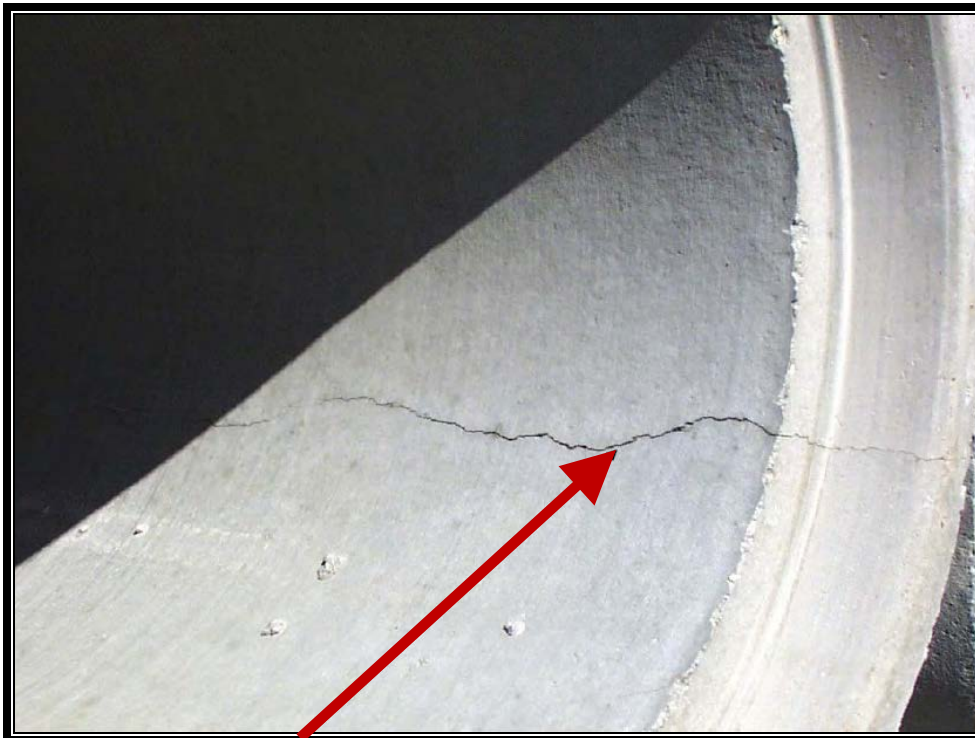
Crack Exceeding 0.01 in. and 12 in. in Length – Not Acceptable
